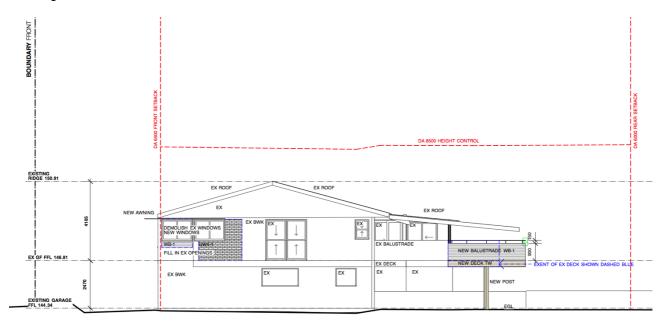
Proposed amended windows and wall balustrade, Partial North (Side) Elevation
